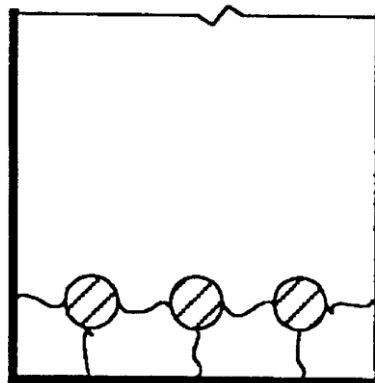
concrete splitting cracks between FRP bars and concrete cover in cross-sectional view.
